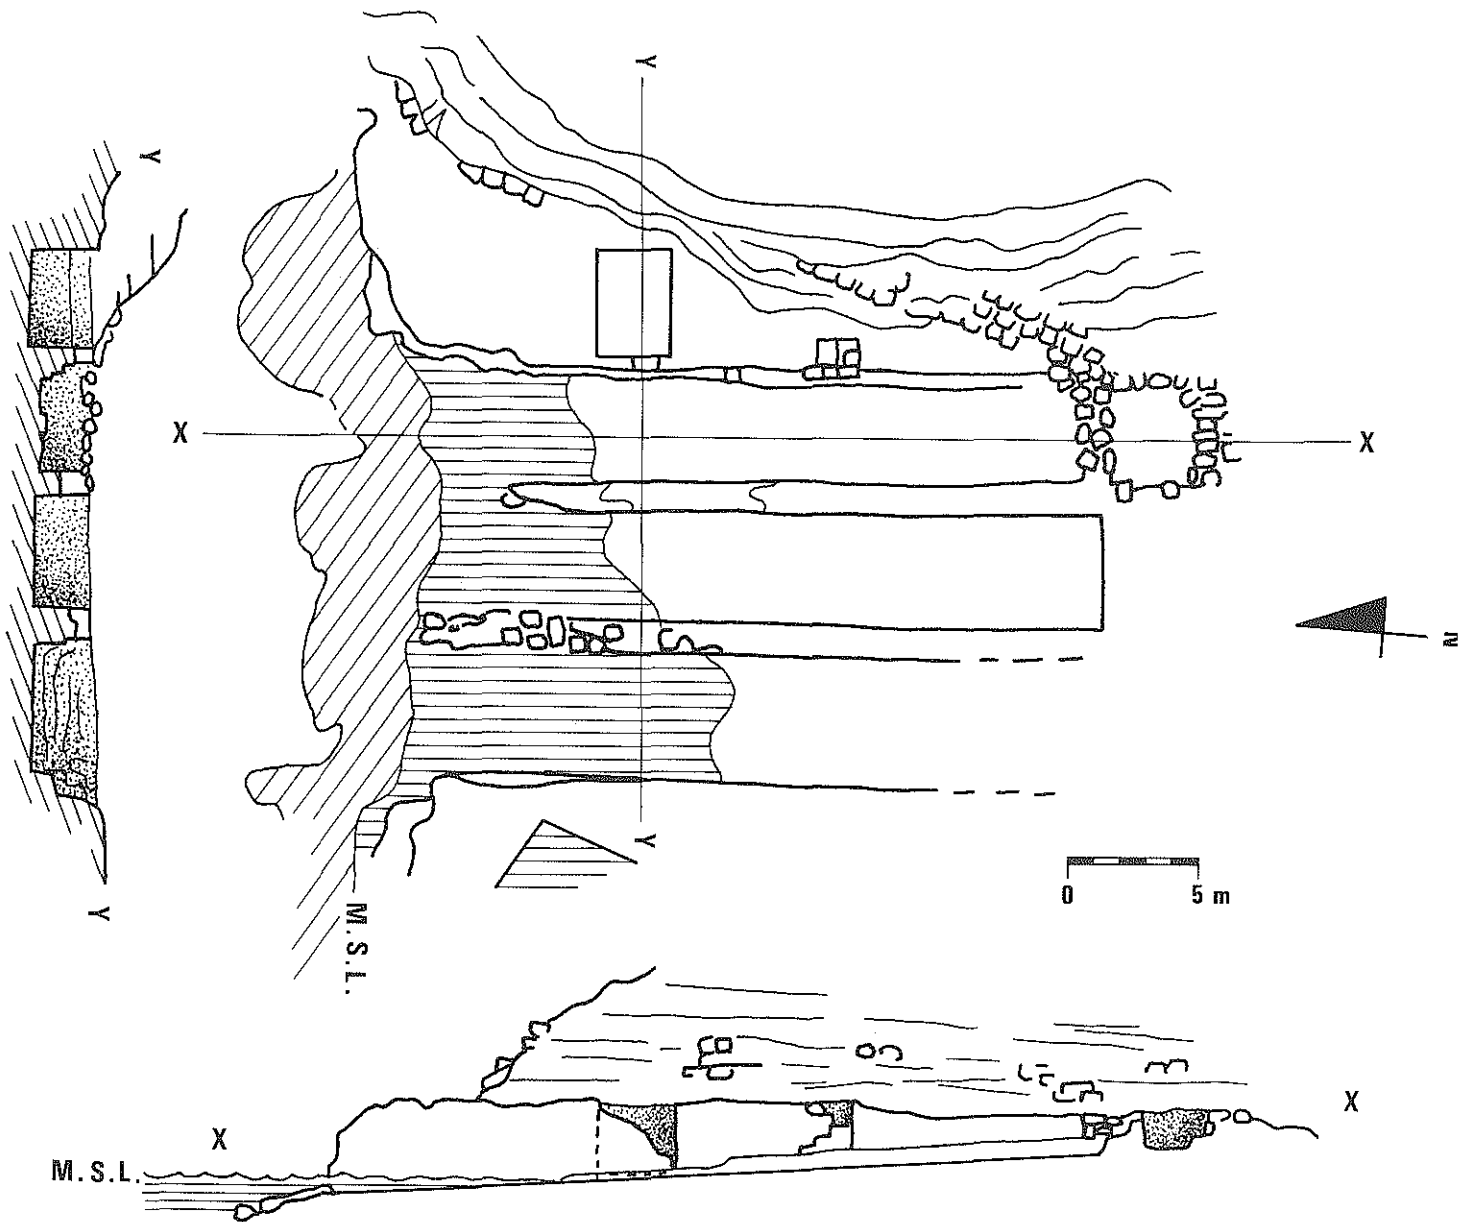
Plan and sections across the rock-cut slipways at Tel Dor.
